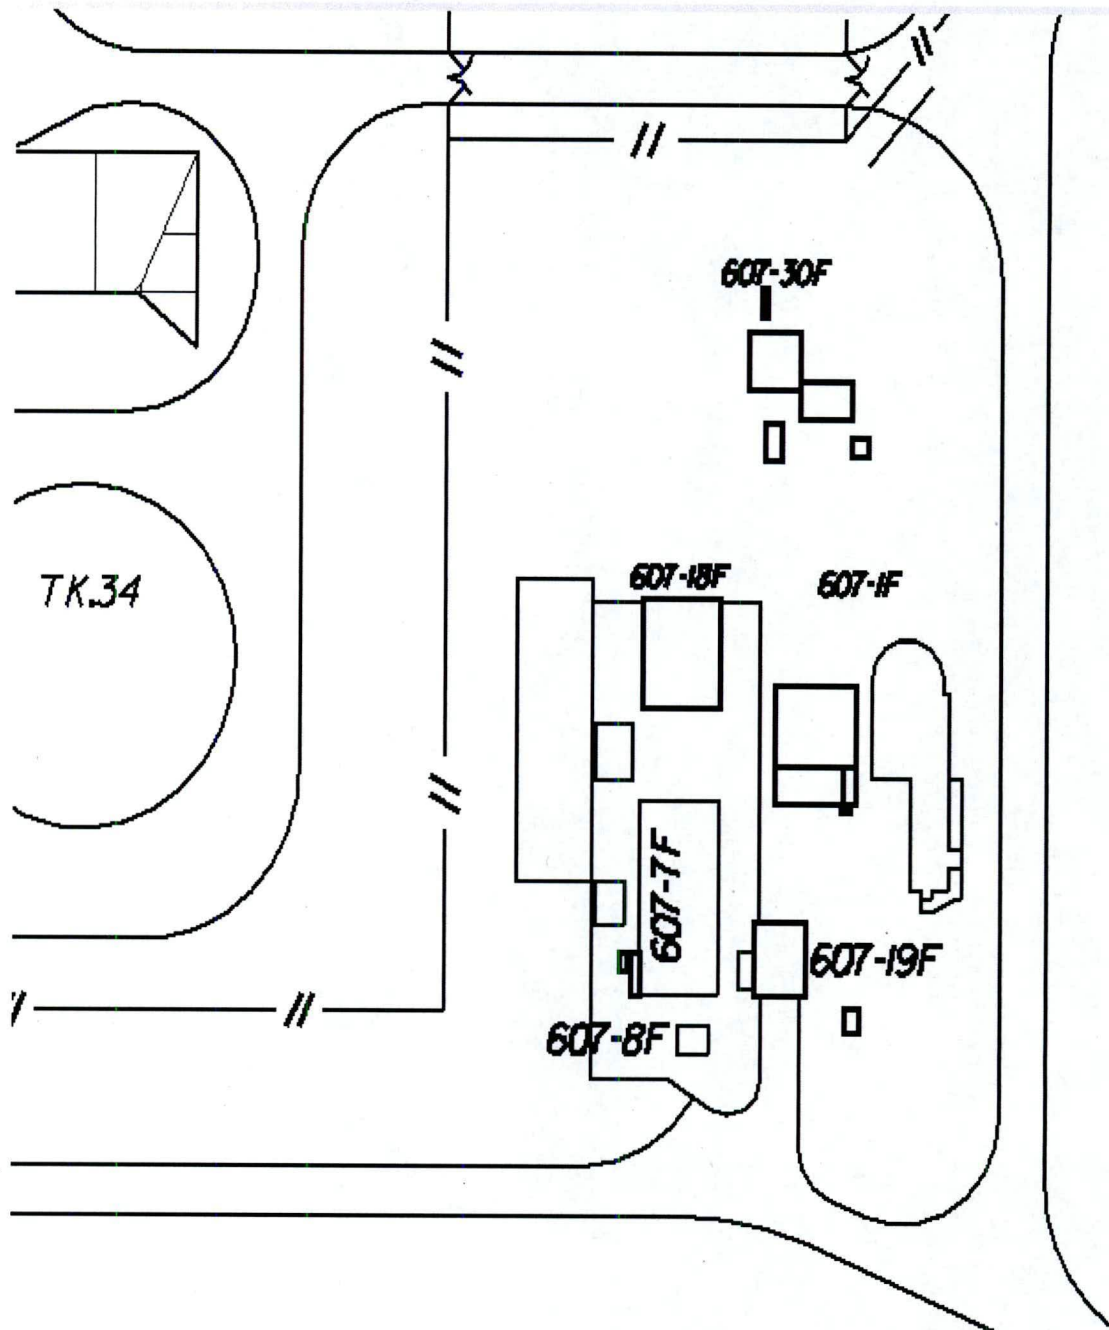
Plan View of 607-1F Sewage Treatment Plant
